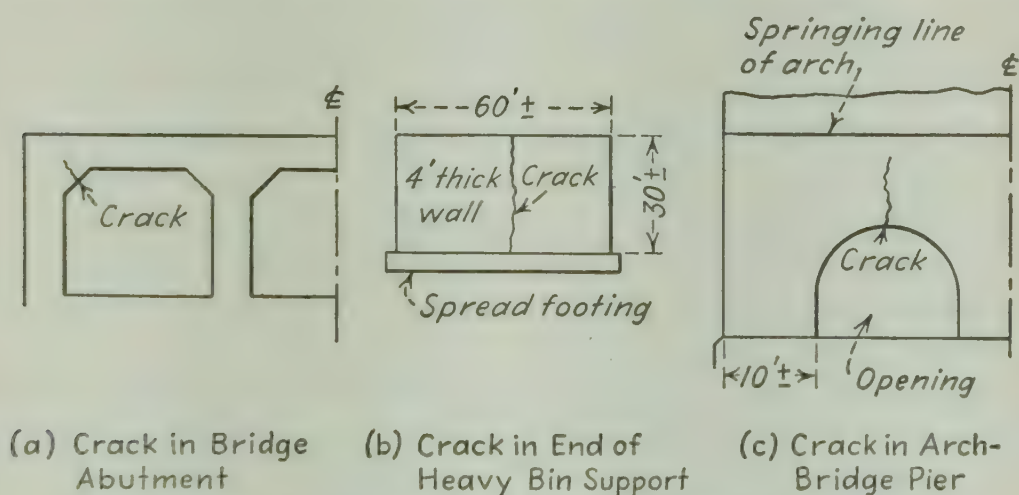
Examples of shrinkage cracking of heavy structures.
